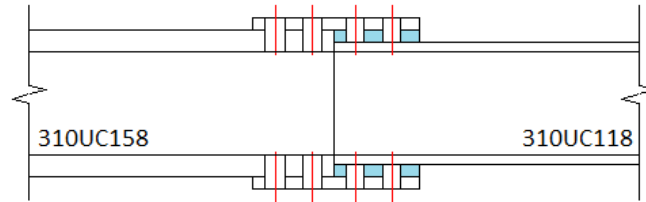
Schematic view of Specimen #2, (No web splice - 12mm flange plates and 6mm filler plates)
